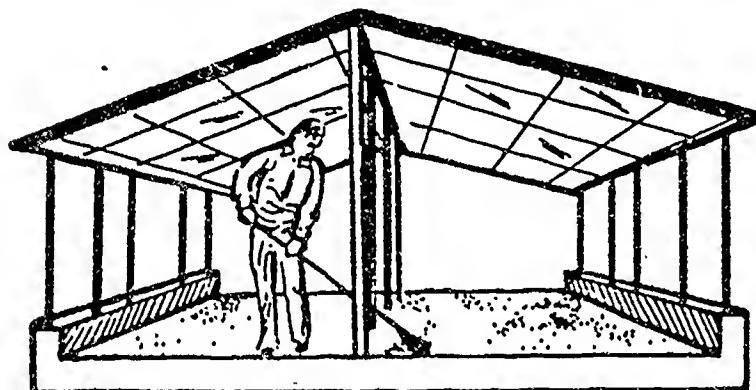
Plastic-covered concrete drying floor for coffee, Columbia
